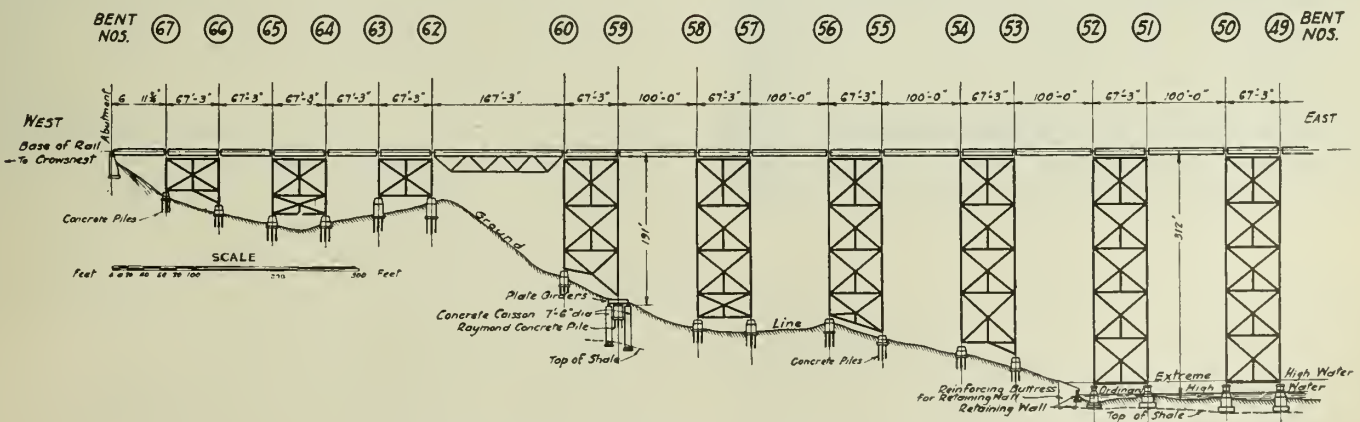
Elevation at West End of Lethbridge Viaduct.
